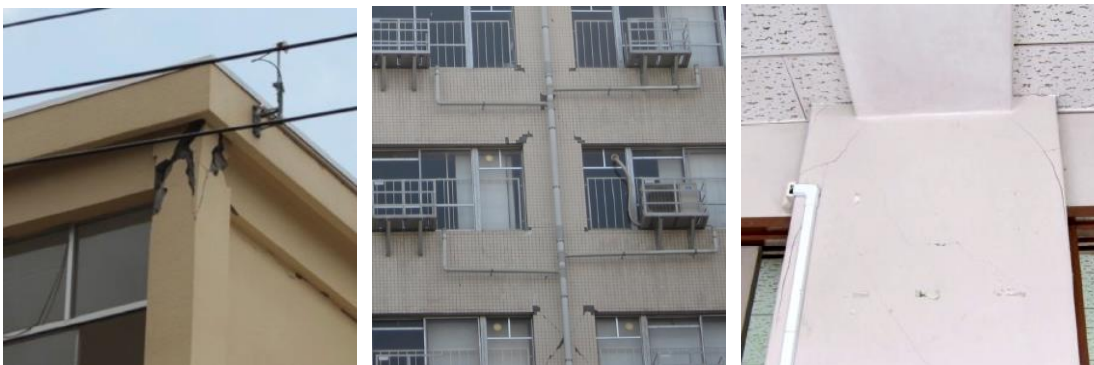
Common damage in beam-column joints [1-9]
